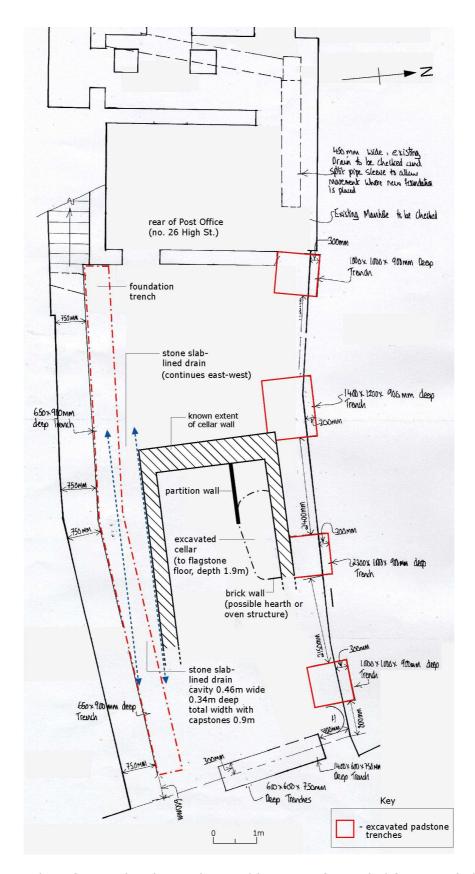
Plan of groundwork trenches and location of revealed features (adapted with acknowledgement to Llwyd Edwards, architect)
